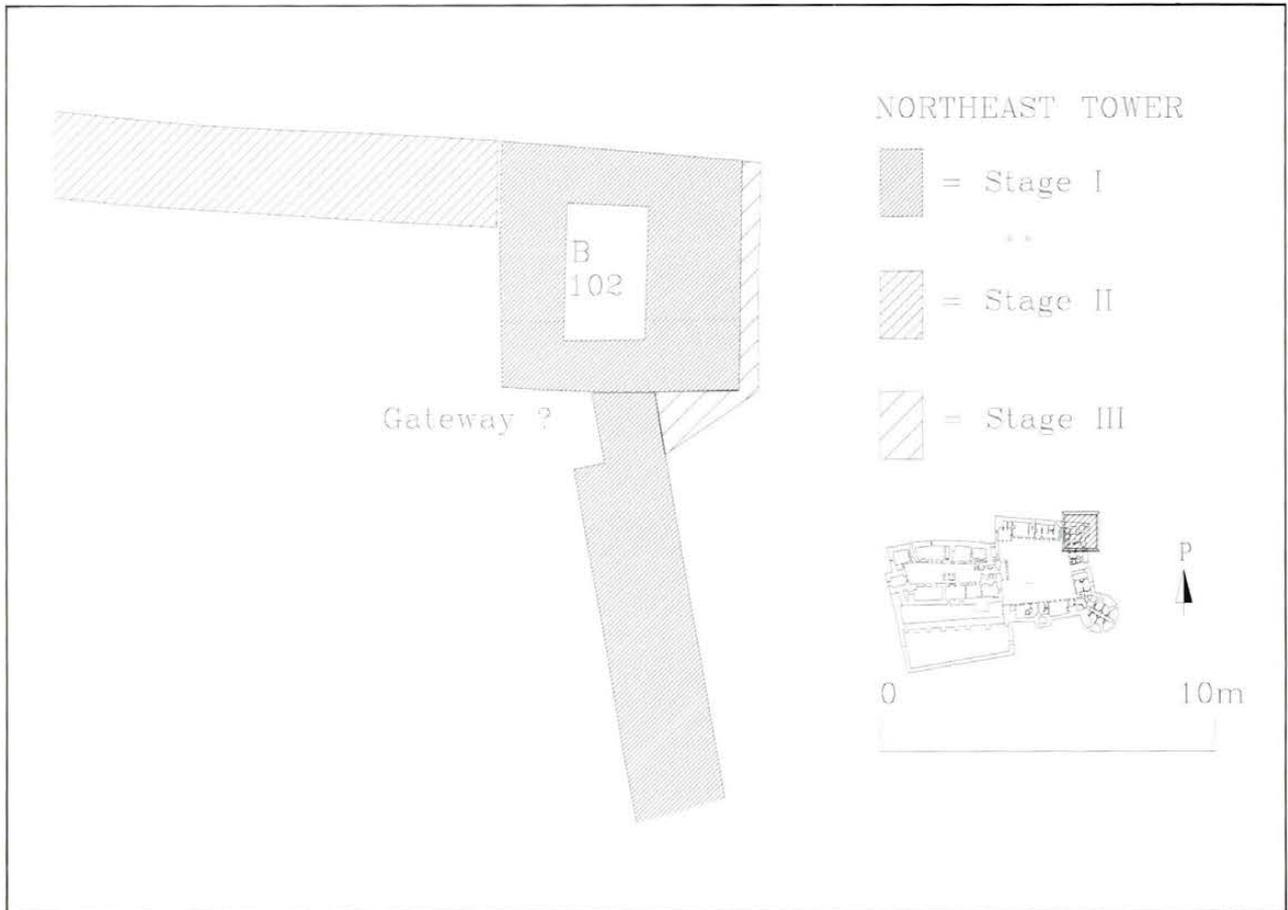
History of construction of the northeast tower of the east outer bailey of Turku Castle. (Drawing by K. Uotila)
